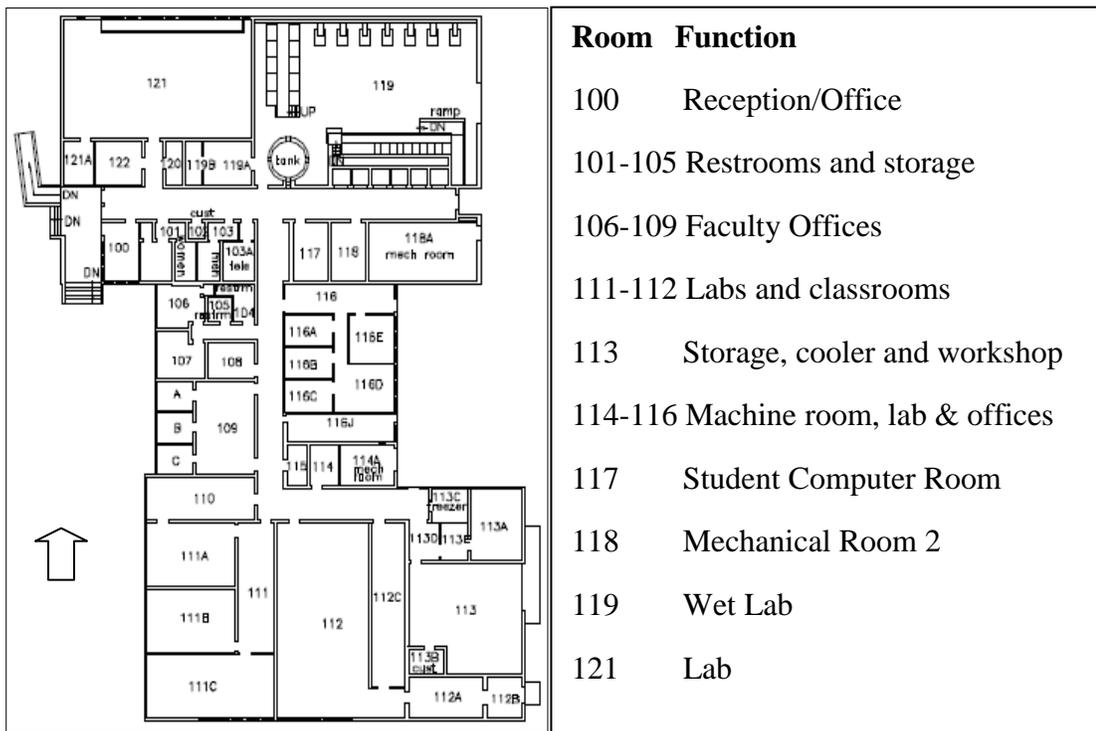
Floor plan of the Telonicher Marine Lab with room allocation.
